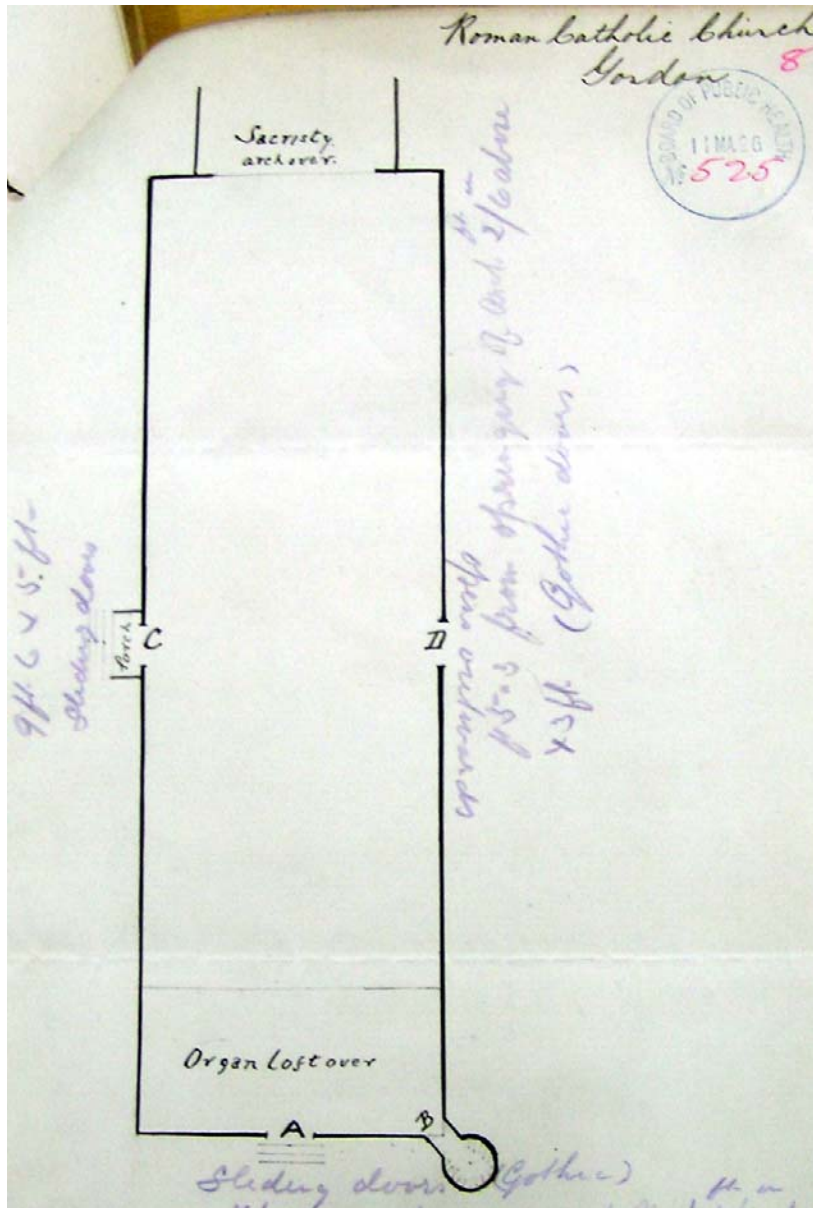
Sketch plan of St. Patrick's Church, 11 May 1896.
